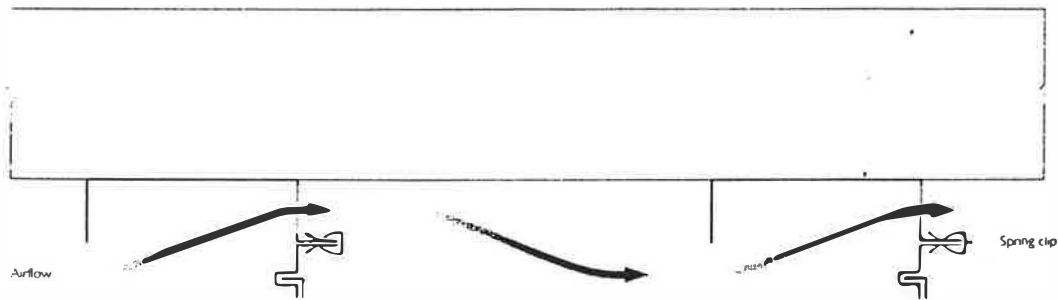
Extract from British Steel/SCI publication entitled 'Environmental Floor Systems' illustrating air ceilings
